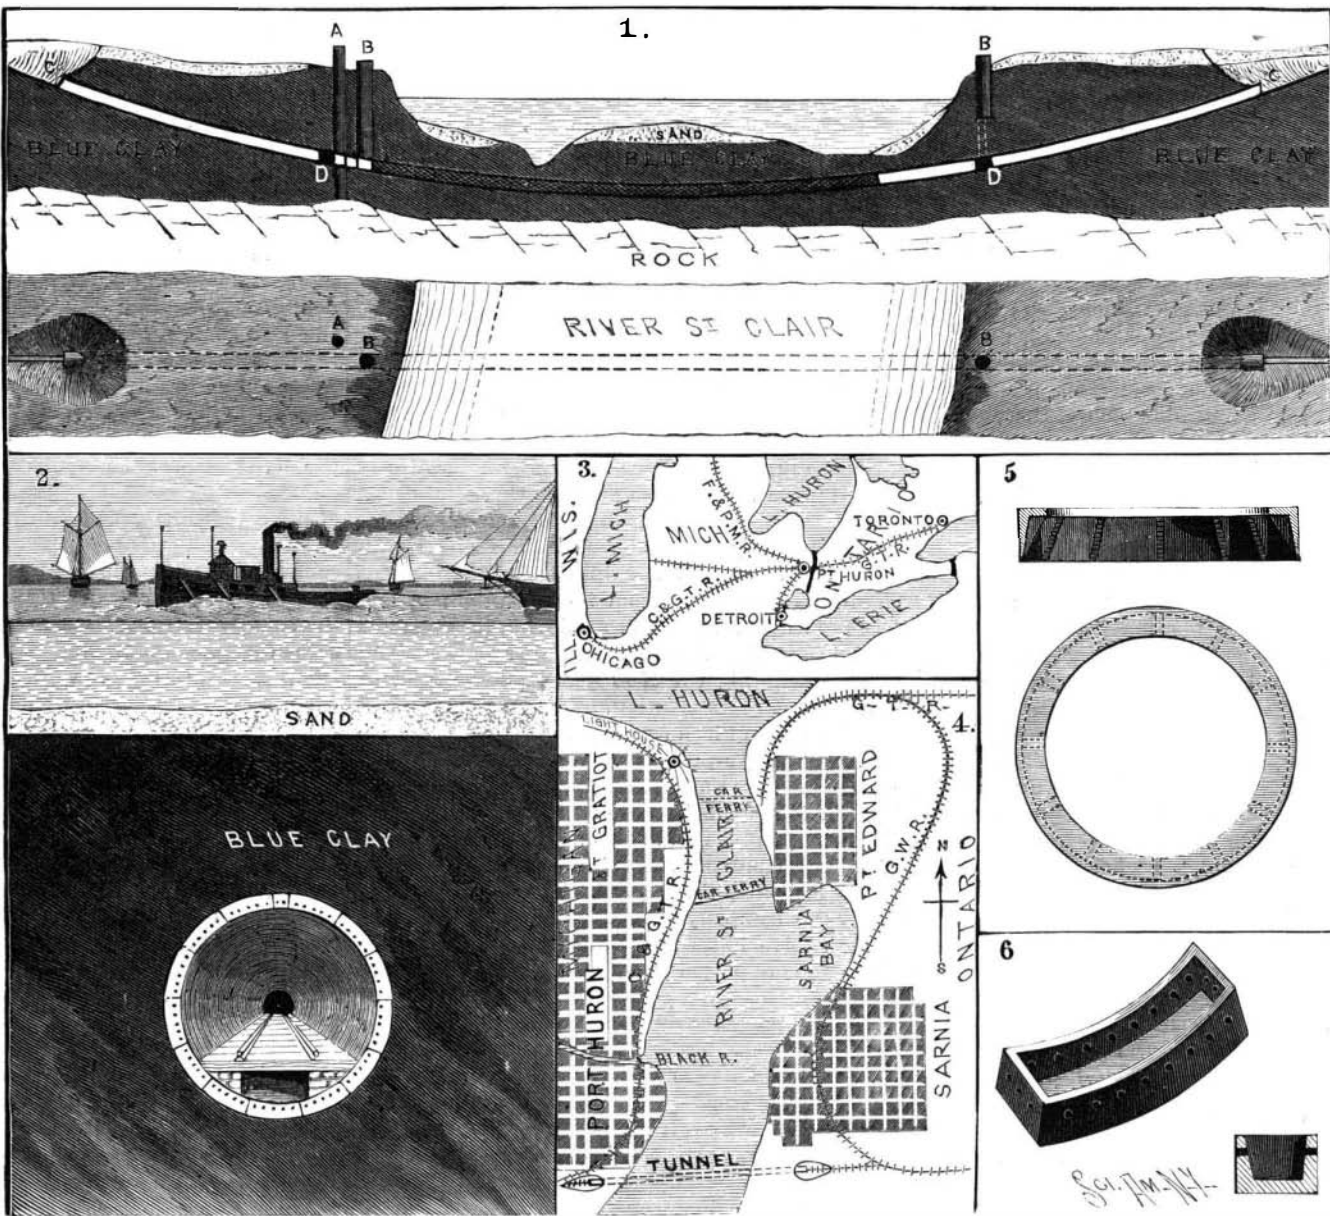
Sectional elevation and plan of tunnel; A, pump shaft, B, brick air shafts, C, cuttings, DD, bulkheads. Fig. 2.—Cross section of tunnel and river. Fig. 3.—Map showing location. Fig. 4.—Plan of Pt. Huron and Sarnia, showing position of tunnel. Fig. 5.—Section and plan of iron shoe of shaft. Fig. 6.—Segment of cast iron of which the tunnel is composed.
